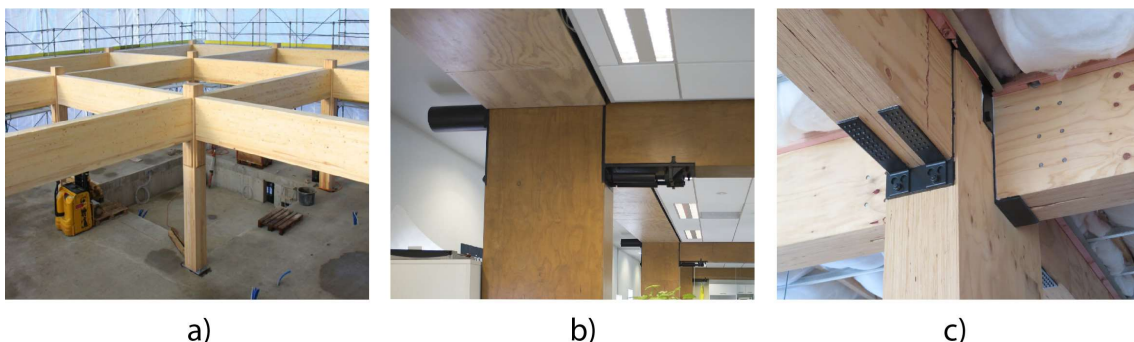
Post-tensioned timber buildings. (a) ETH House of Natural Resources (HoNR), Zurich (copyright of ETH Zurich/Marco Carocari). (b) Merritt Building, Christchurch; (c) Beatrice Tinsley, Christchurch.
